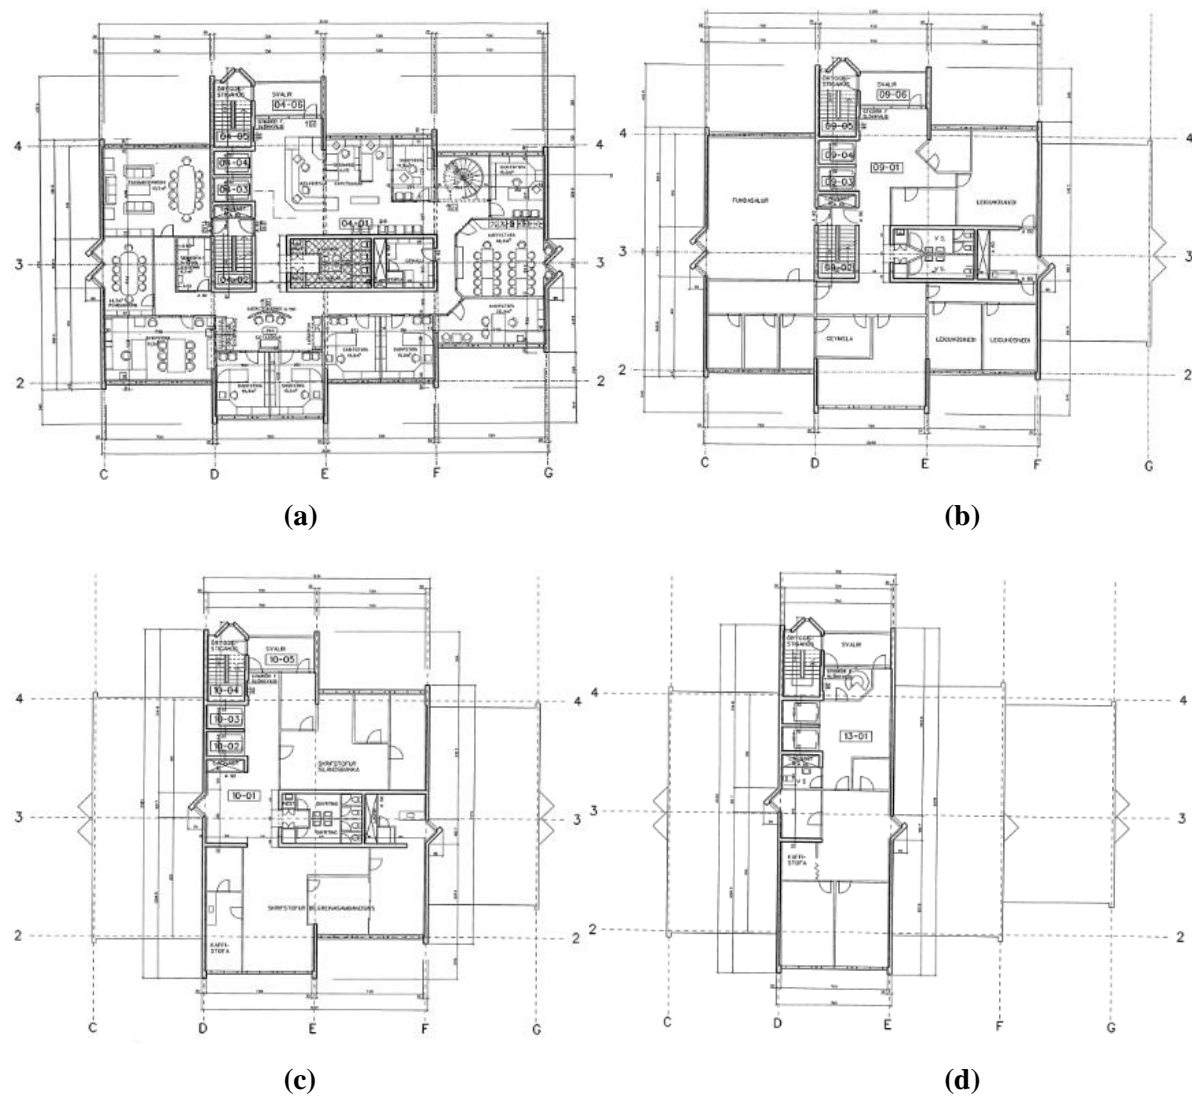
Horizontal cross sections of the building. (a) 2nd to 8th floor, (b) 9th floor, (c) 10th floor and (d) 11th to 13th floor (Sveinsson, 1996).
